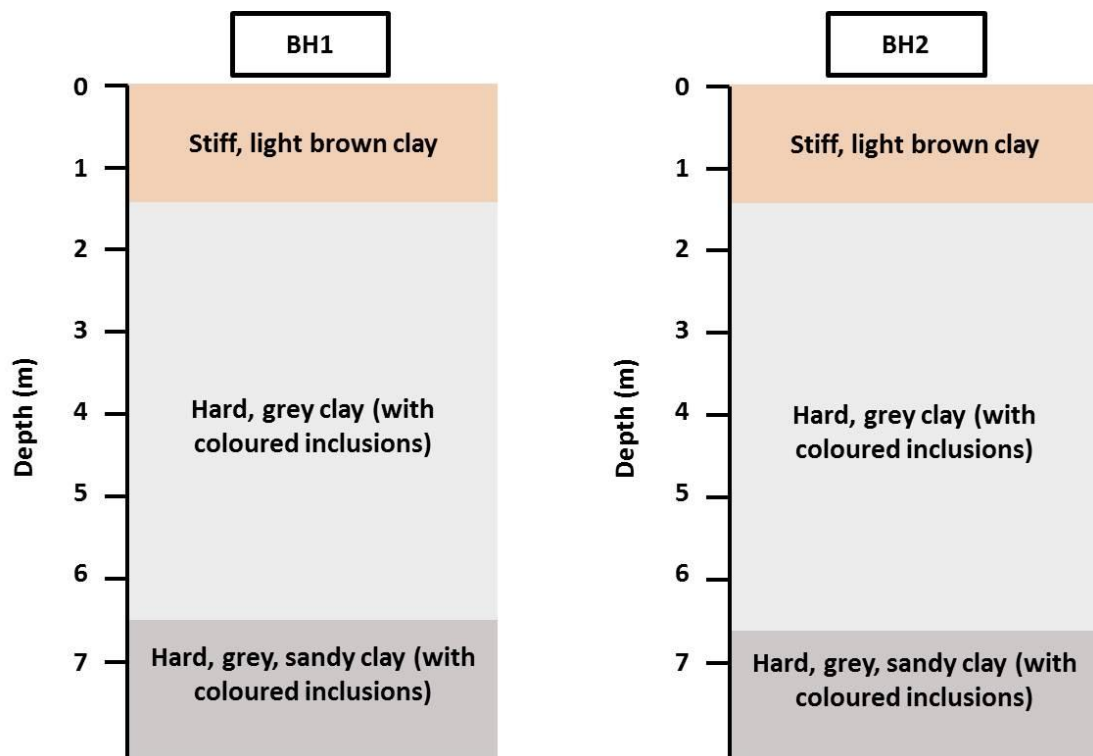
Typical soil profiles for the field-test site at Lawnton
